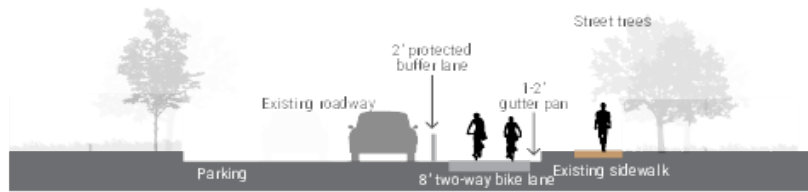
Fergus Falls GET: On-Road One-Side Typical Section
